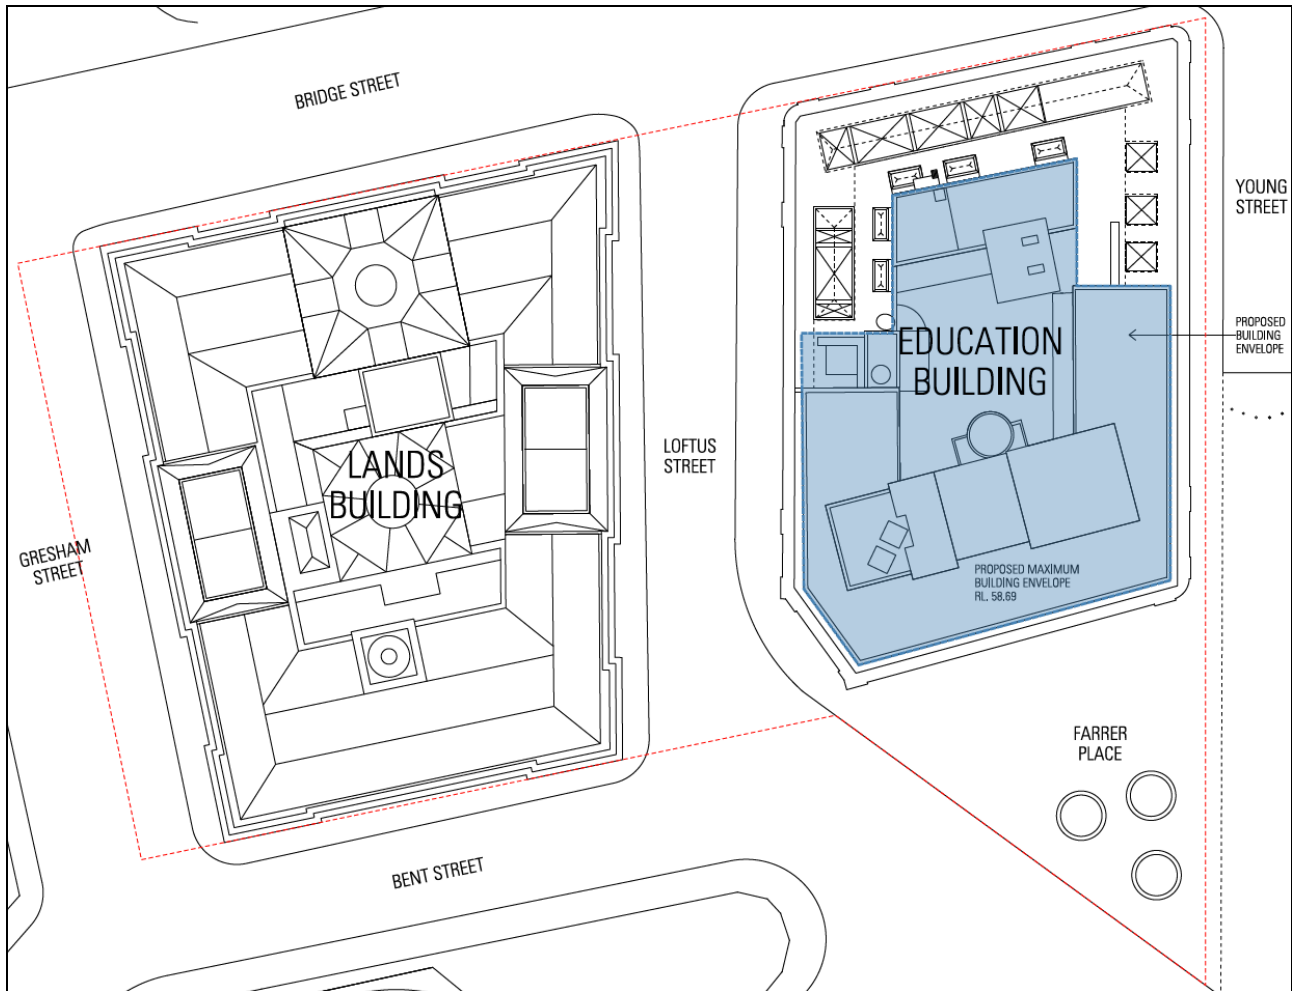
Layout of proposal with site outlined in red and proposed concept envelope in blue
